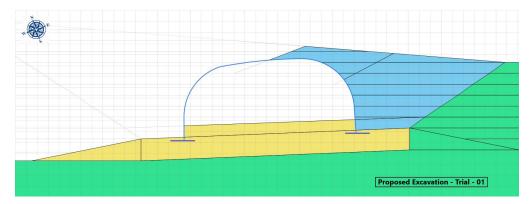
Plan view - Proposed Excavation - Trial 01
